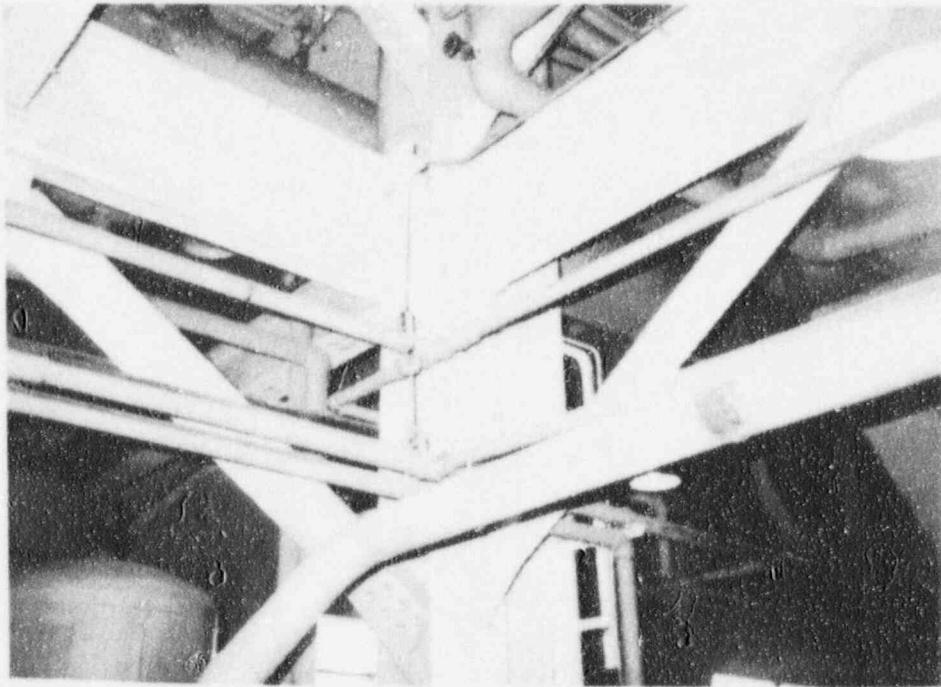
Pipe Supporting Pipe in Centro Unit 1
